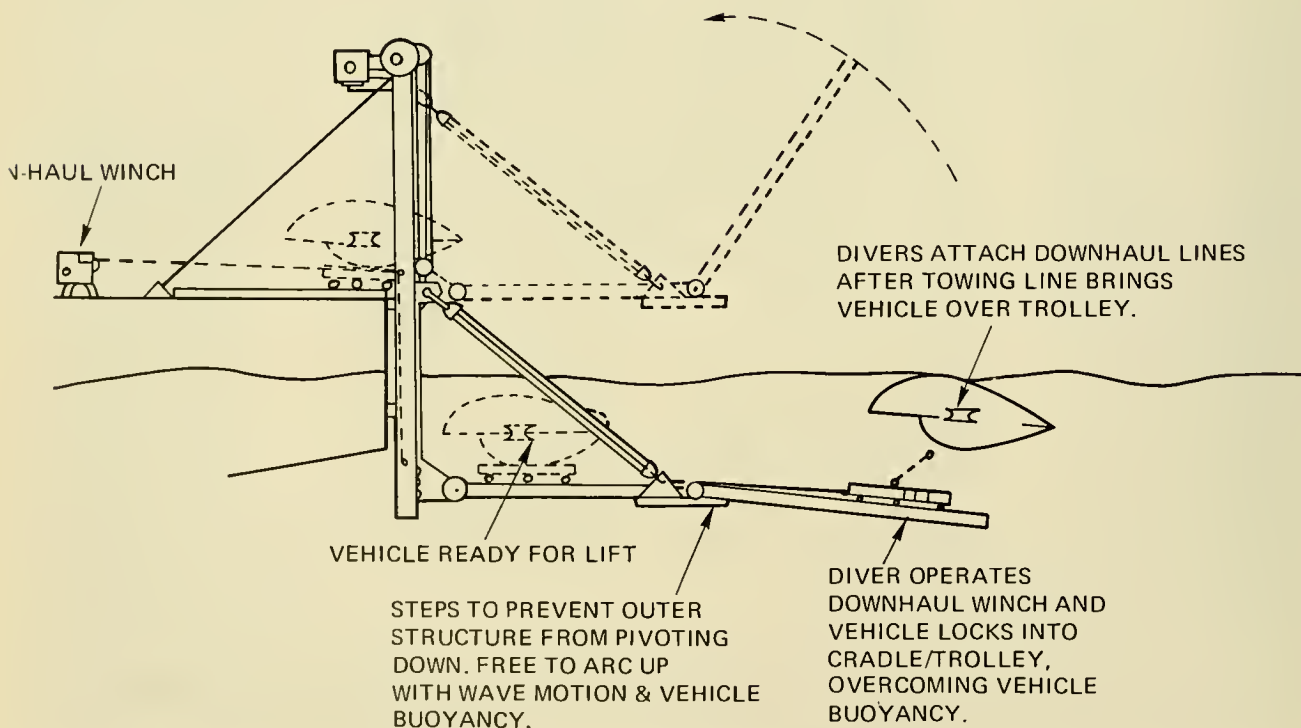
Elevator concept. (F. Willet, Westinghouse)
